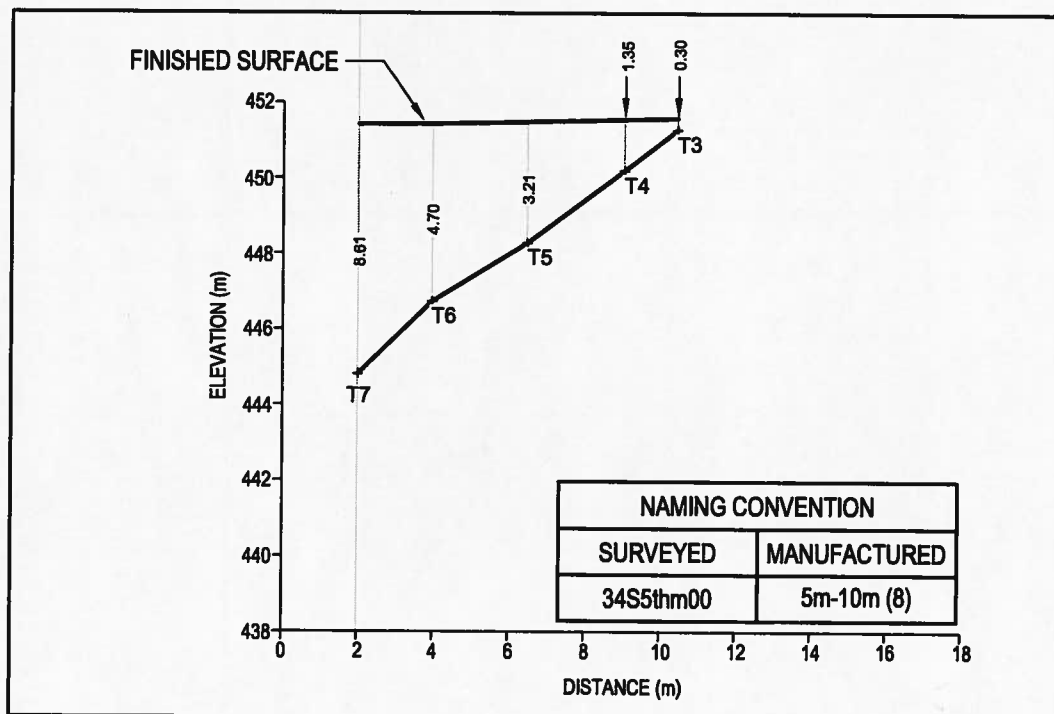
34S5thm00 (5m-10m (8)) - AS MANUFACTURED, PLAN, AND SECTION
